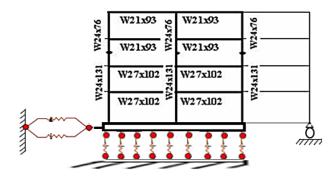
2D building model with SSI. The 2D frame and strip footing are shown in thick lines. Elements of the leaning column are shown in thin lines.
